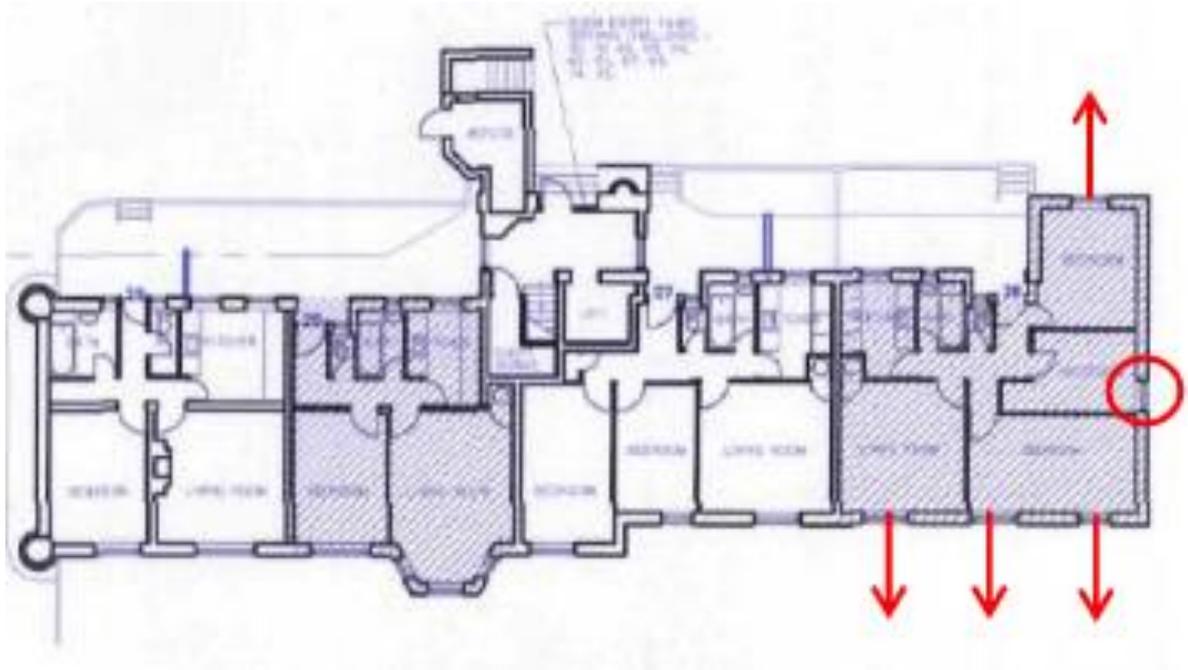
Floor Plan showing the Layout of Twyford House (relevant windows circled in red)
